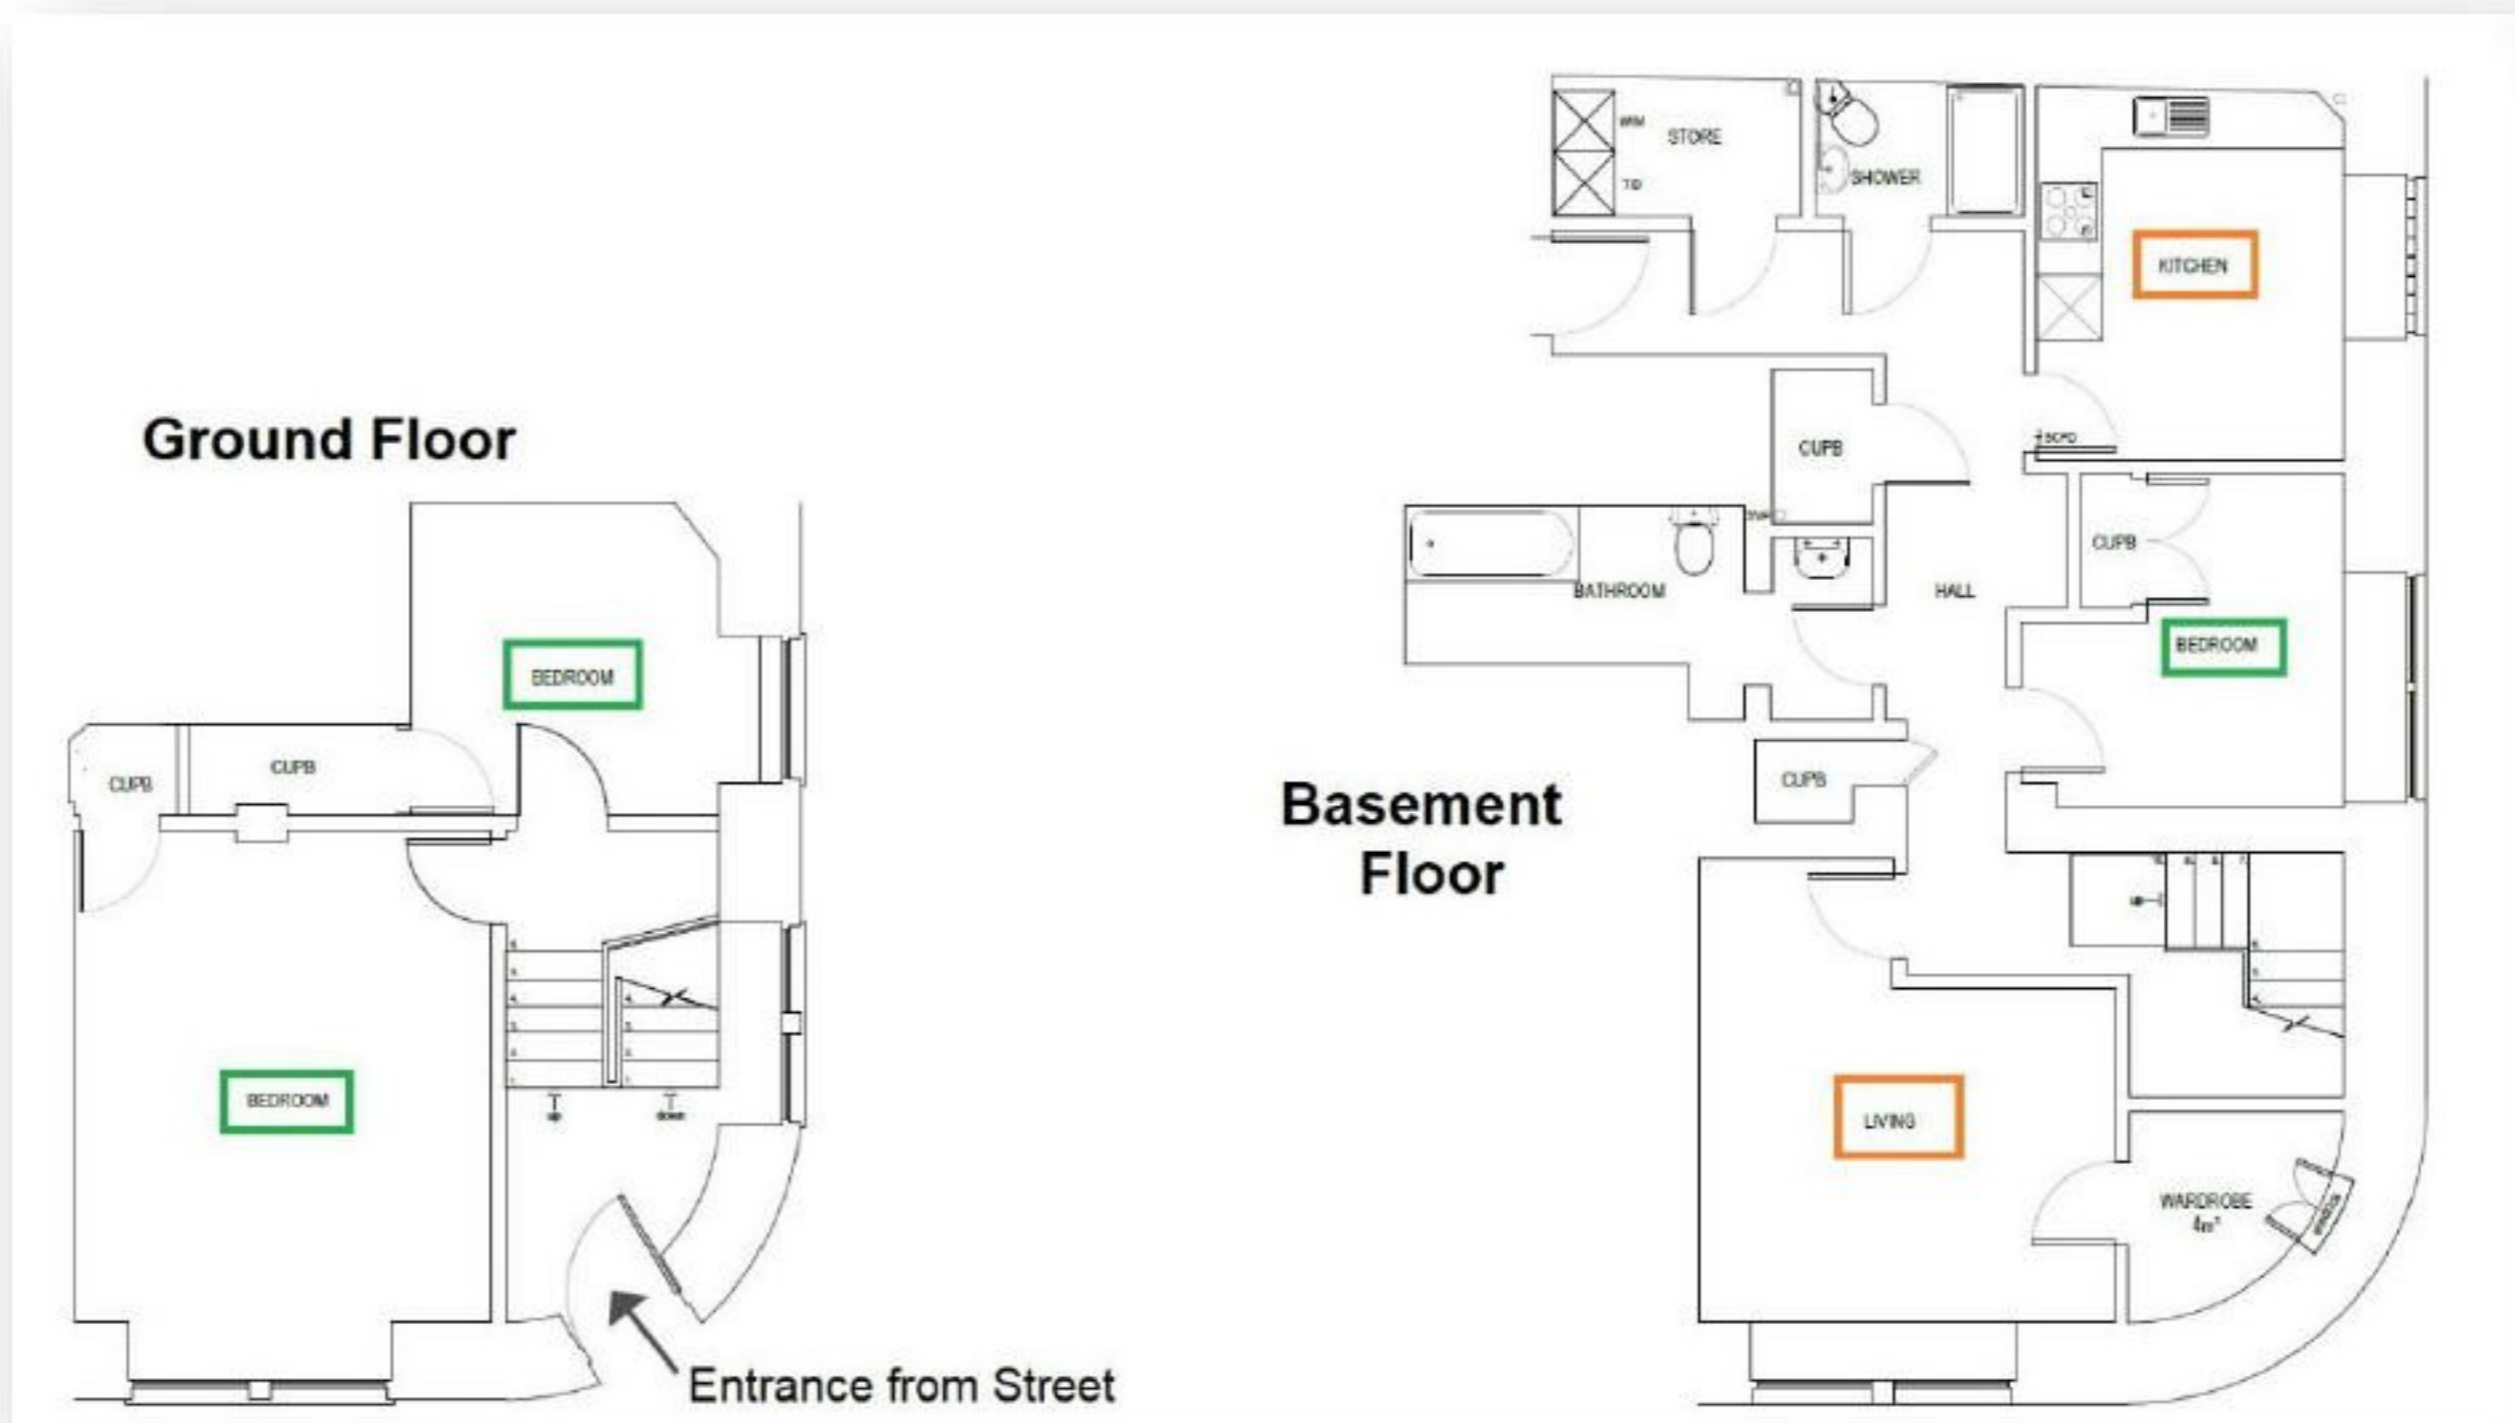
The floor plans (bedrooms highlighted green, activity spaces orange)
